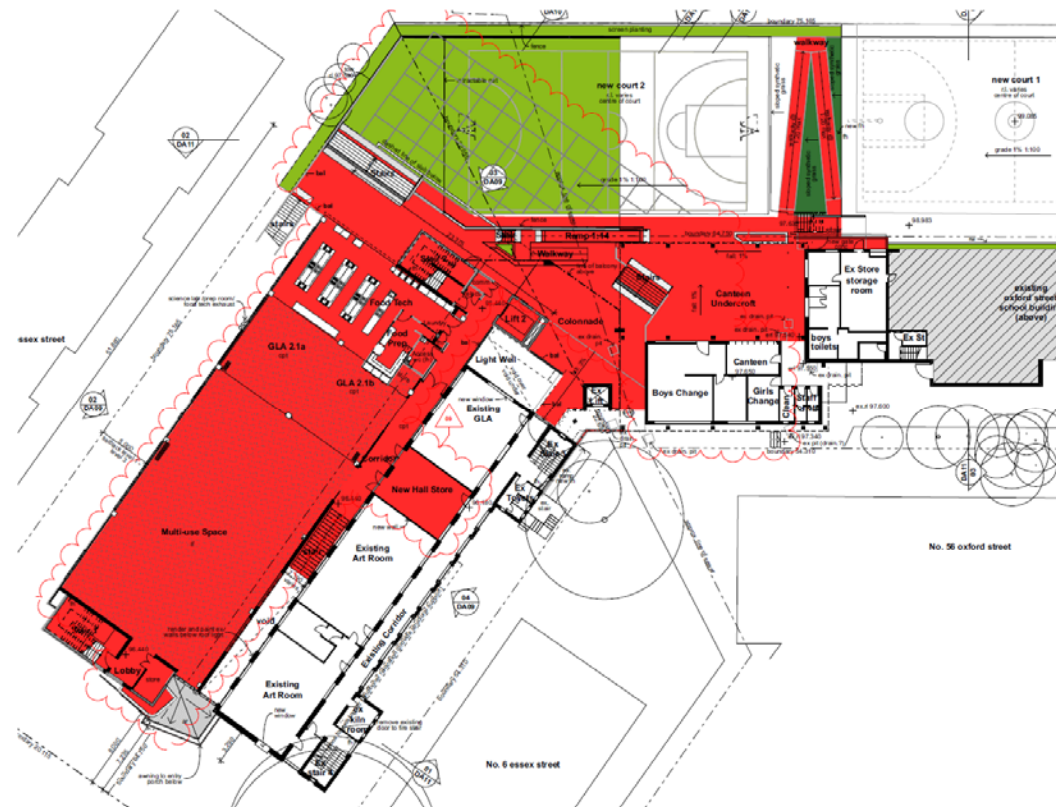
Proposed Level 2 plan under DA/89/2017/C.
